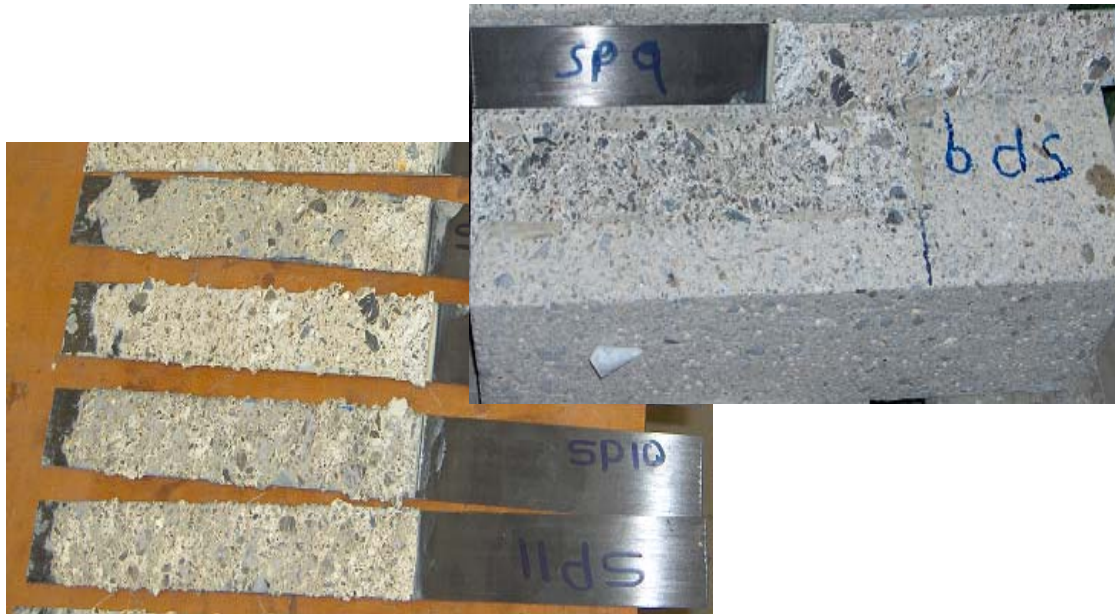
Typical failure modes for un-conditioned prism specimens
